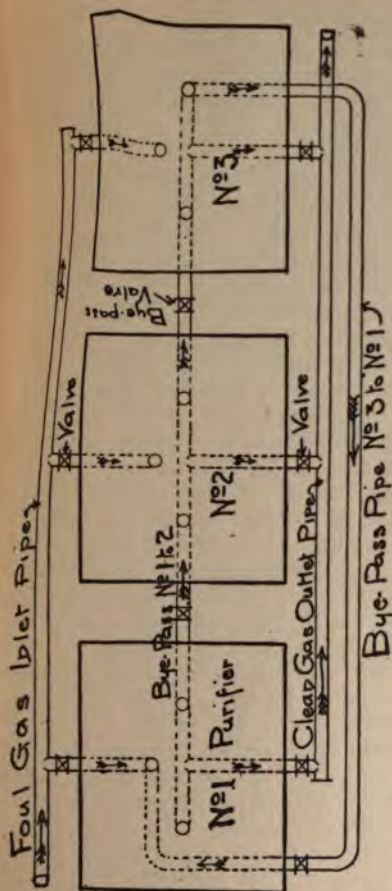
System of connecting Pipes for a set of Purifiers.
